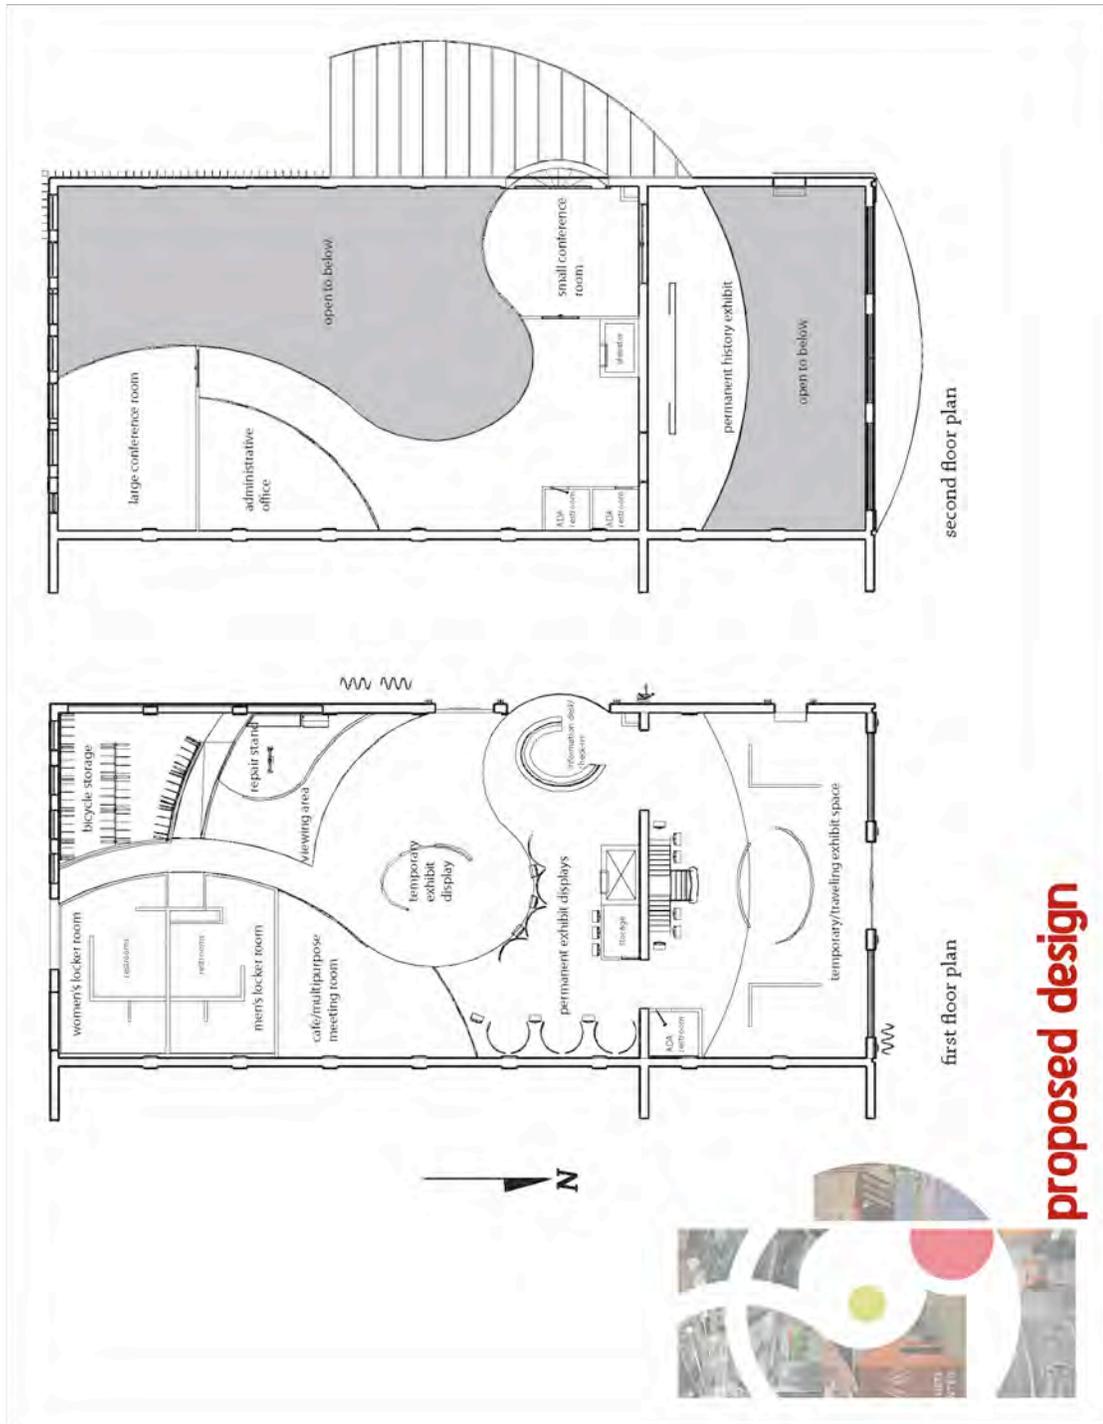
Proposed Design. Plans generated in *AutoCAD 3D*.
